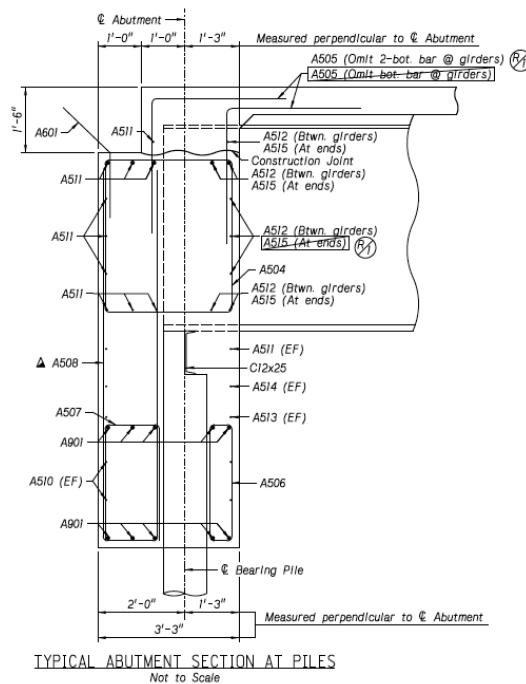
Details of the Superstructure/Abutment and Pile/Abutment Connection of the Integral Abutment Bridge in Nebraska (drawings retrieved from Big Springs West I-80 Loop Bridge)
